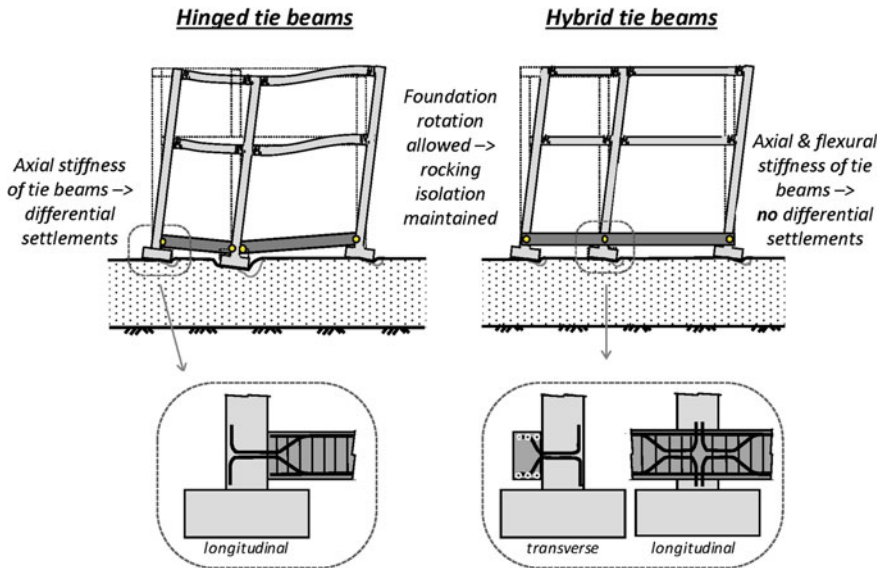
Novel concepts for the seismic retrofit of existing buildings through addition of: hinged tie beams (left); and hybrid tie beams (right)
